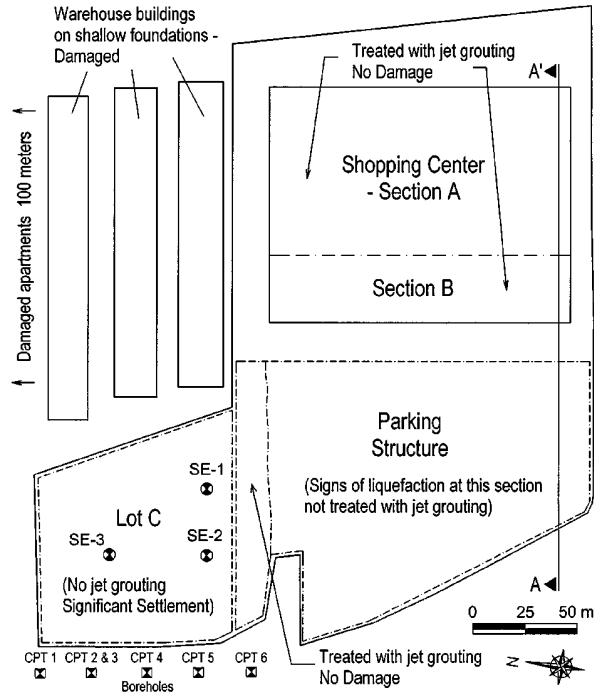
Site plan of Carrefour Shopping Center showing Lot C with settlement extensometers (SE) (Martin et al. 2004).
